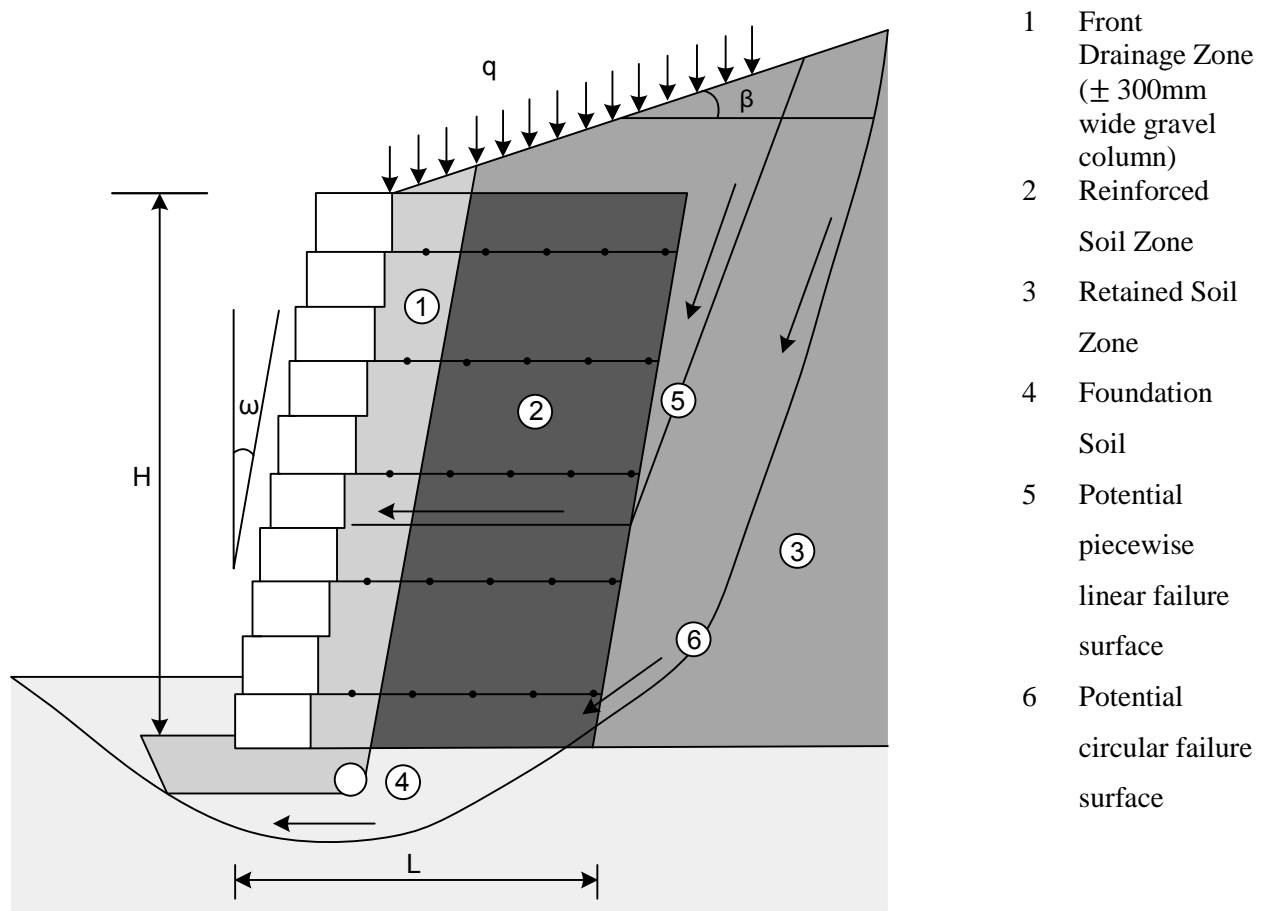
Cross-section of a typical reinforced CRB wall (Koerner & Koerner, 2009)
